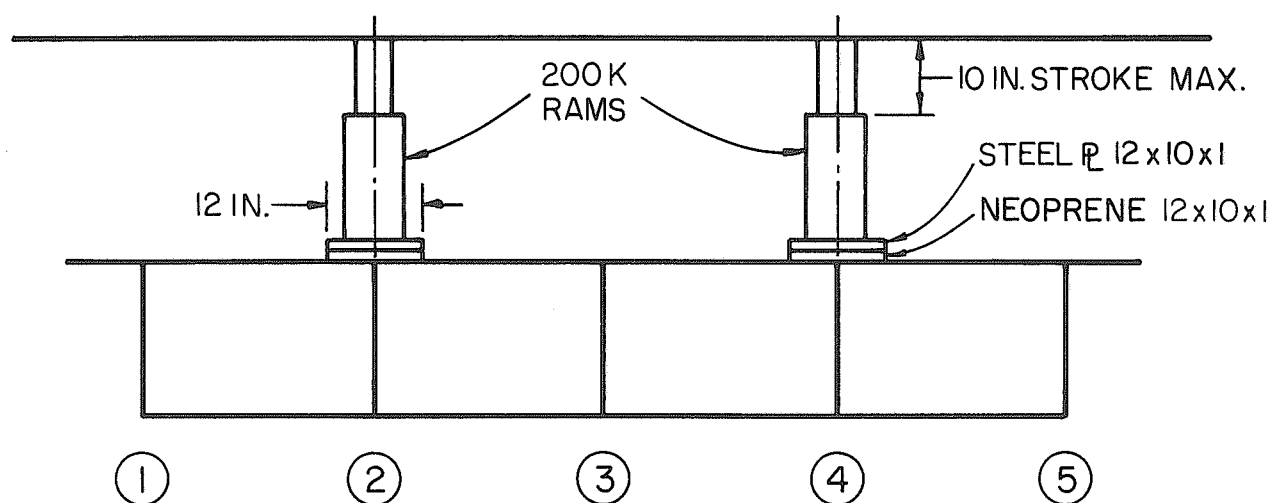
LOAD ARRANGEMENT AT MIDSPANS OF SPANS I AND II FOR FINAL LOADING TO FAILURE
